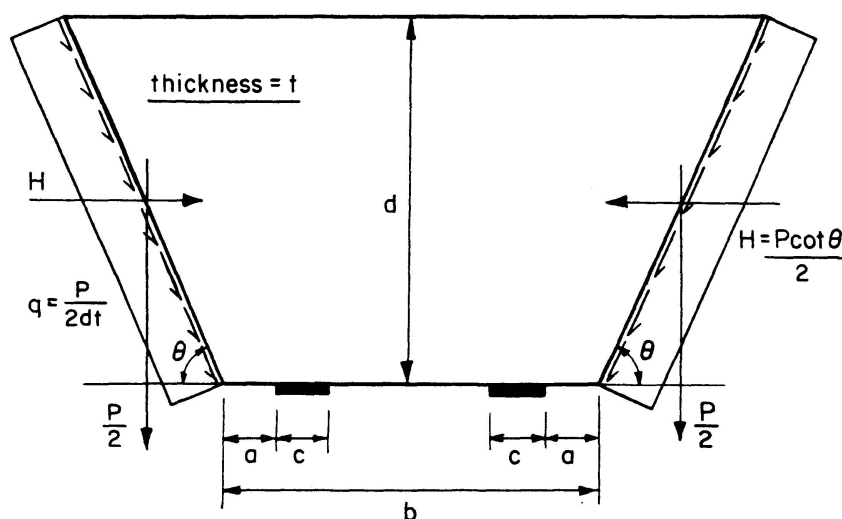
Dimensions and acting forces of a typical diaphragm.
